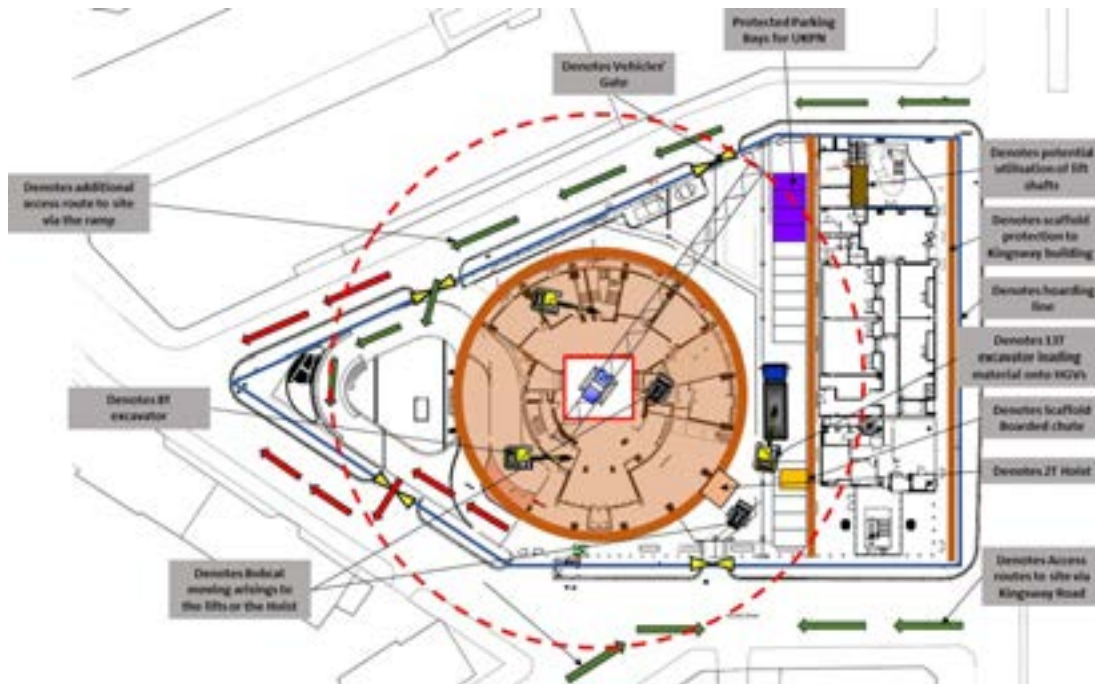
Demolition of the Roof and the 16th Floor of the Tower
